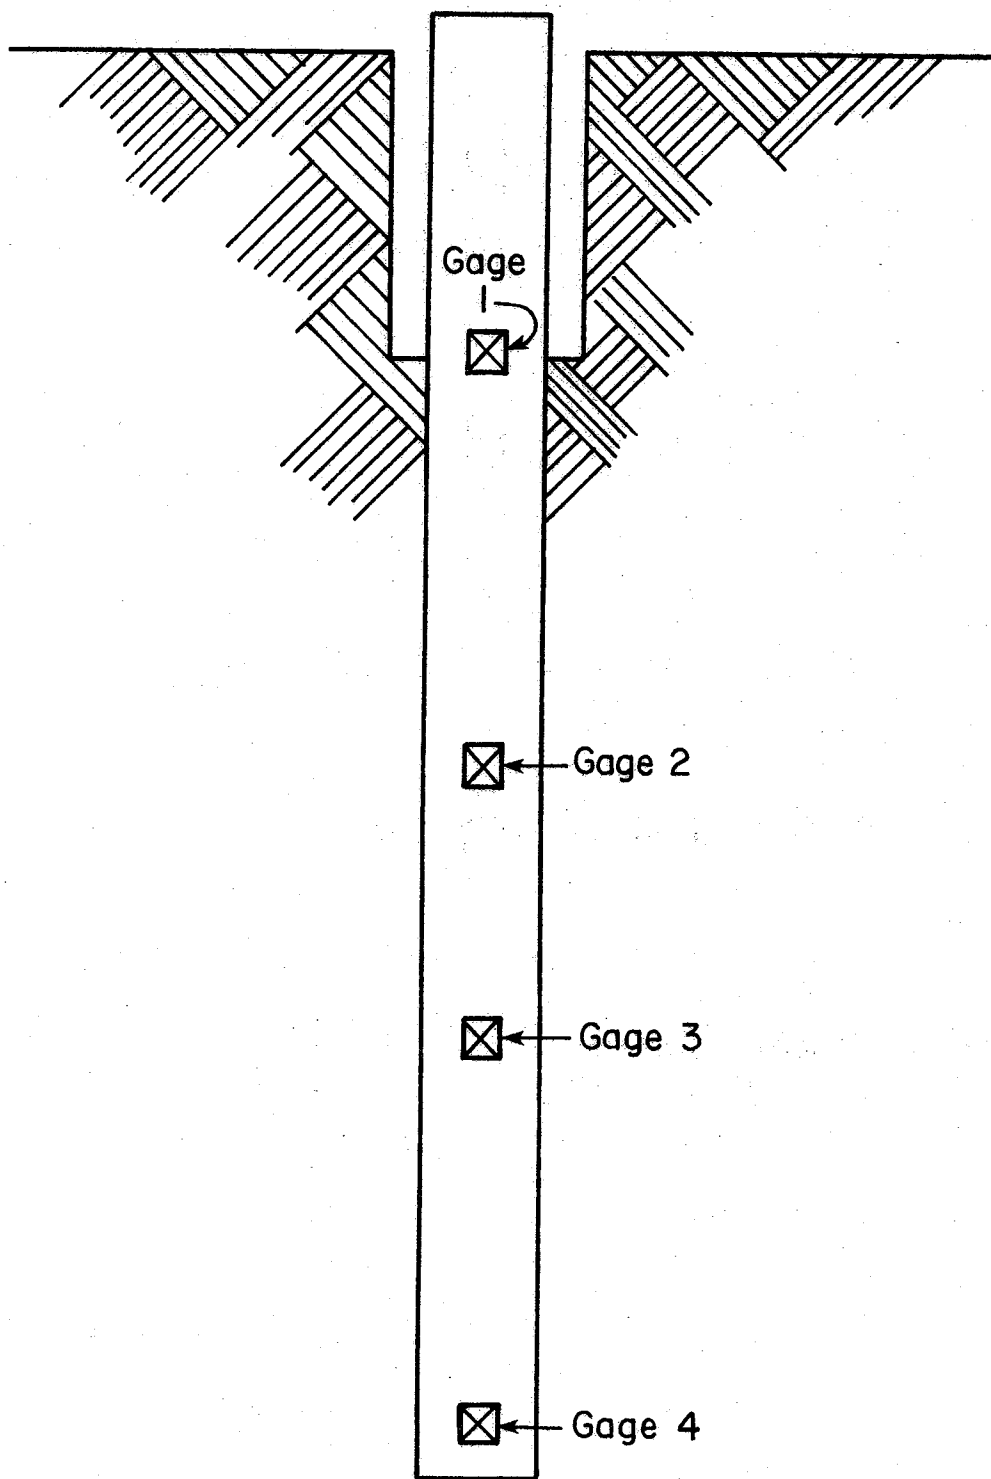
SCHEMATIC VIEW OF INSTRUMENTED TEST PILE
